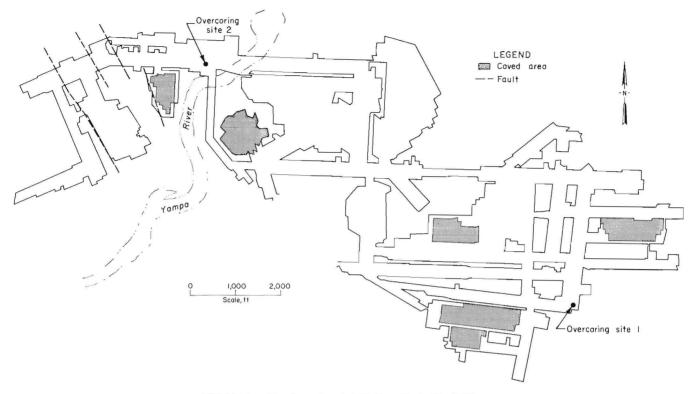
Mine layout and drill sites, Eagle No. 5 Mine.
